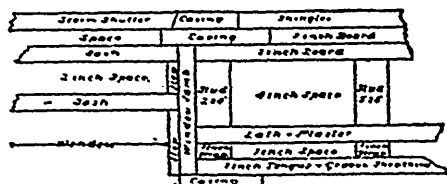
SECTION THROUGH WALL AND WINDOW.
